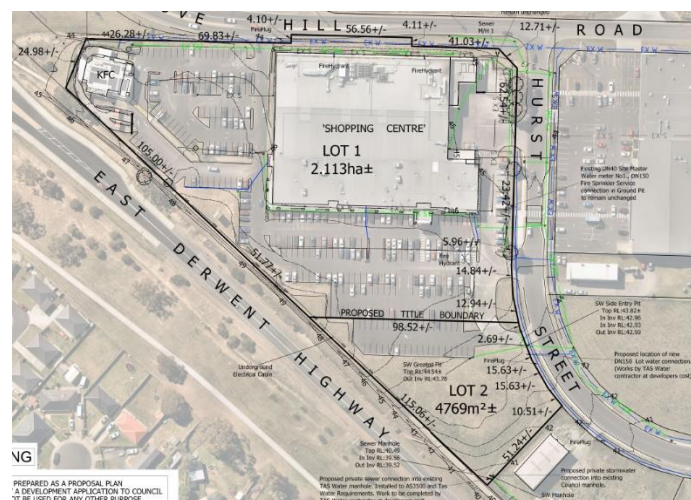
Lot boundaries, showing location of proposed subdivision.
